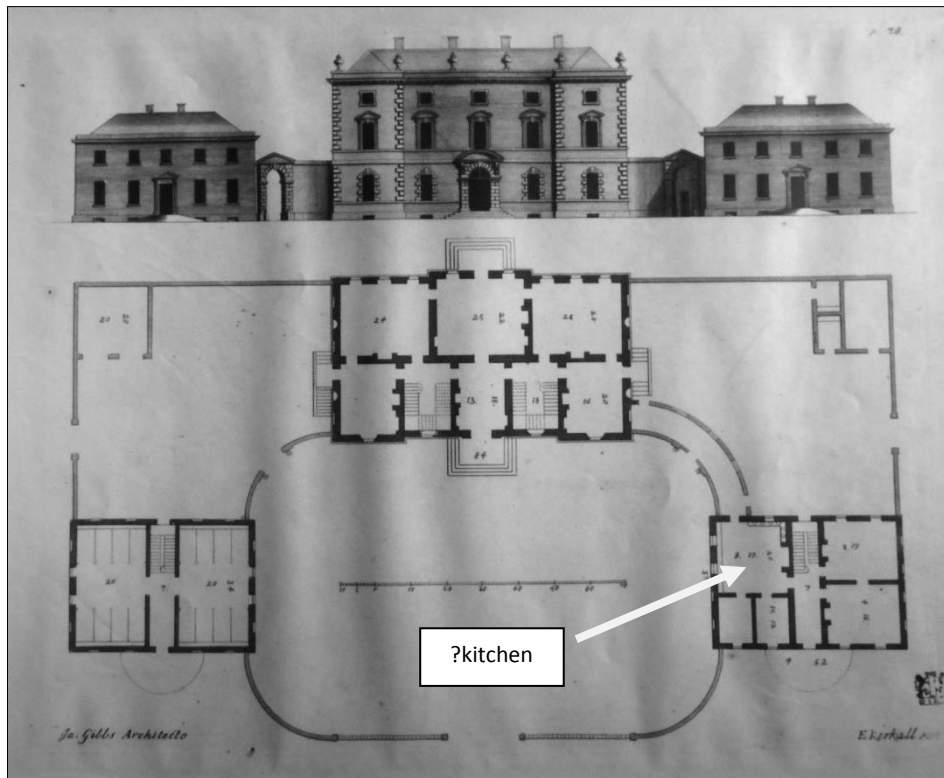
The c1728 Gibb's plan showing the whole ground floor plan, with the kitchen located in the north pavilion (arrowed).
